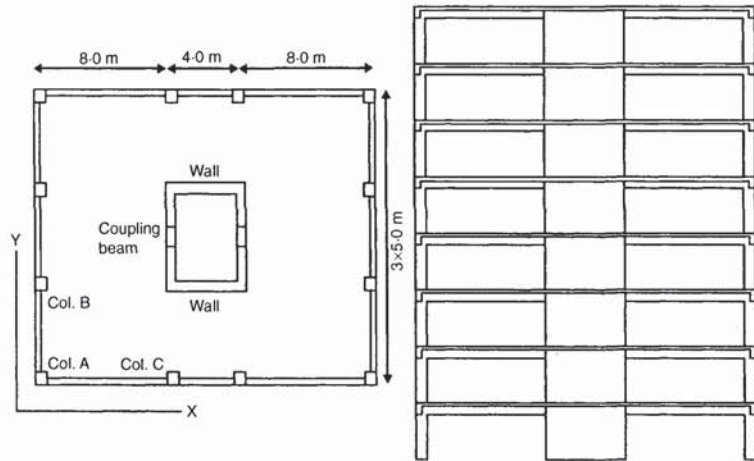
Plan and elevation of 8-storey coupled frame-wall core structure
